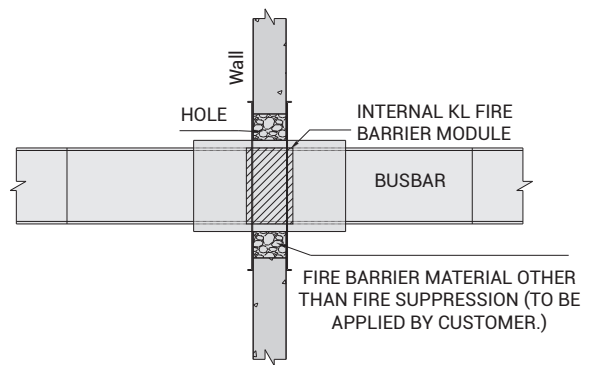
EXAMPLE WALL PASSAGE WITH FIRE BARRIER
